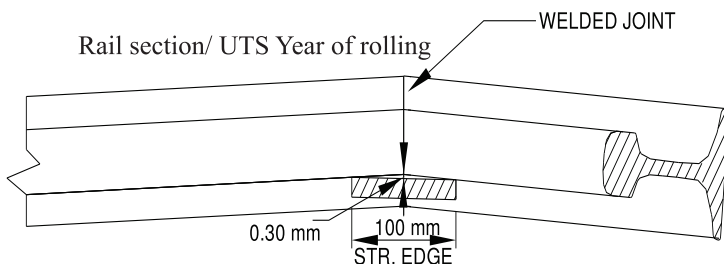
(c) Tolerance for Finishing on Sides of Head of Welded Joint
